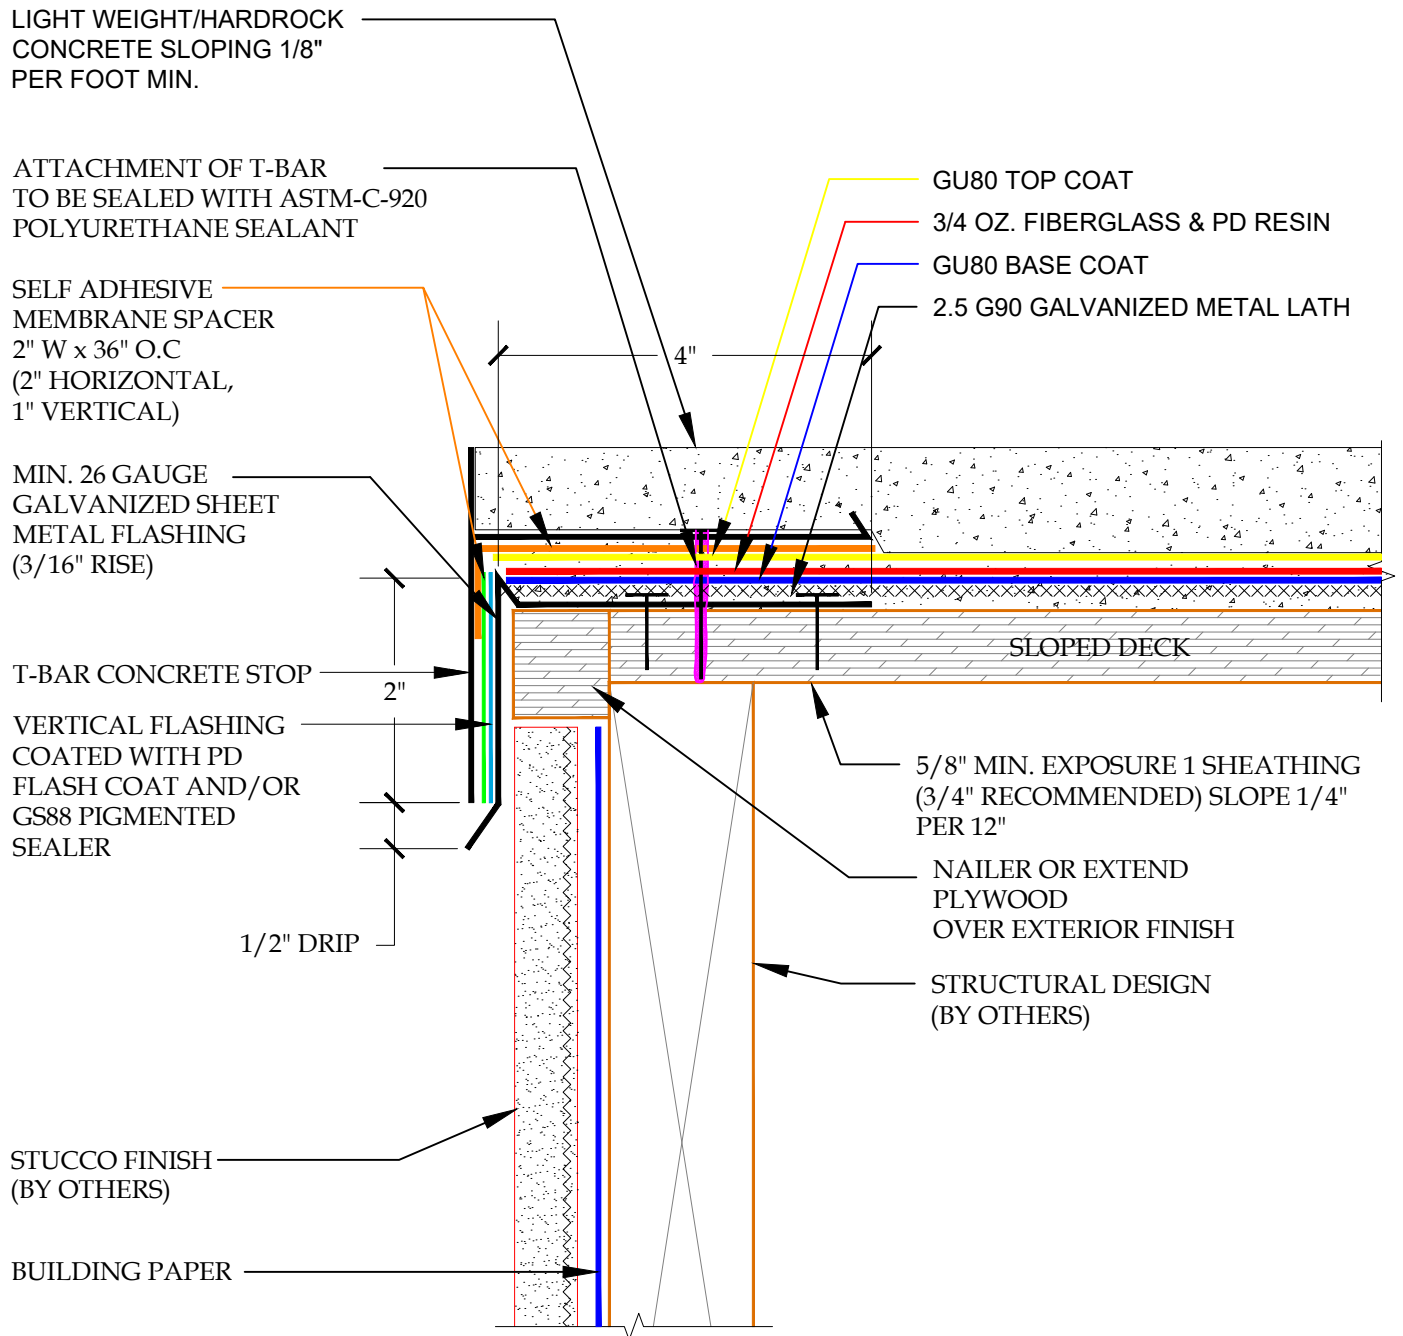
DETAIL-PLI-DEK "U" SYSTEM-THRESHOLD FLASHING DETAIL-
